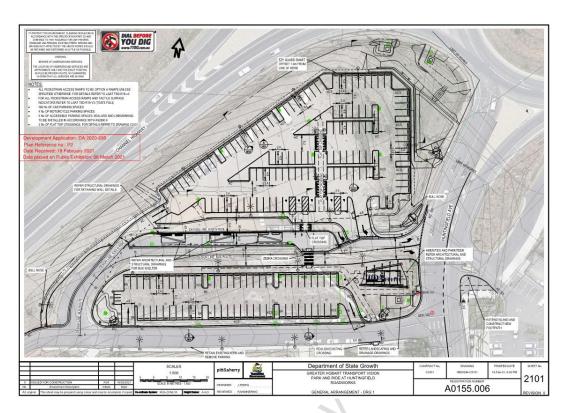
Site Plan for proposed Huntingfield Park and Ride Facility
